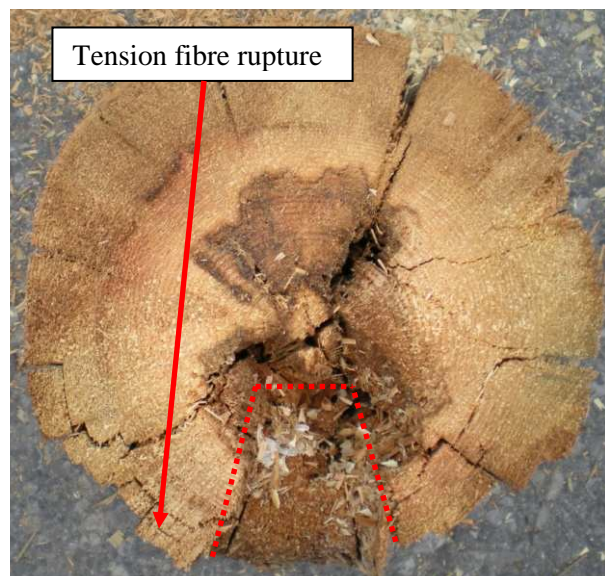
Cross-section of in-service specimen with tension damage (D-3-1).
